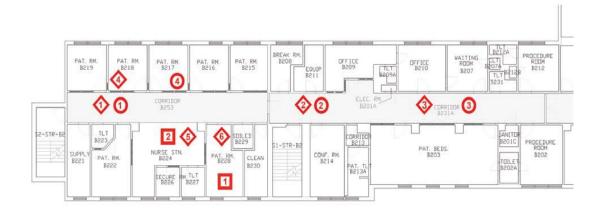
Sample floor plan with detailed acoustic measurement locations.
